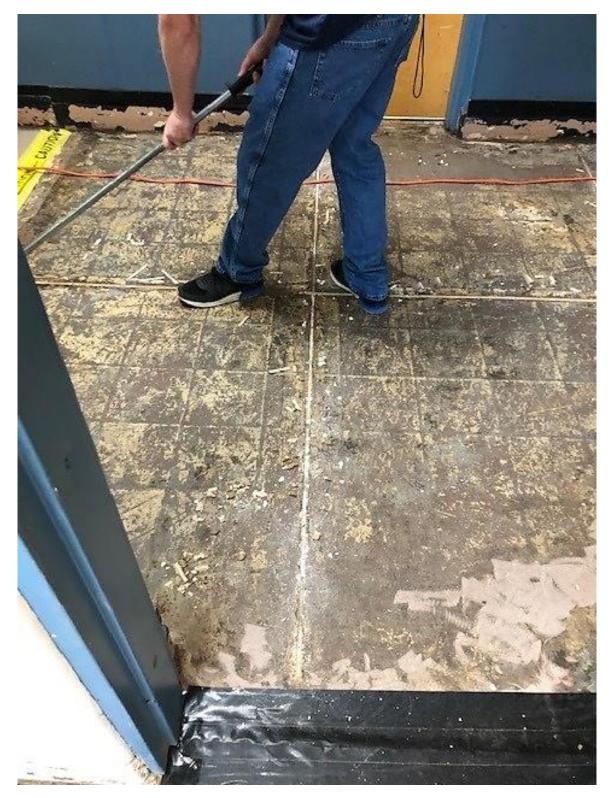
DISTRICT STAFF REMOVING FLOOR LEVELER
